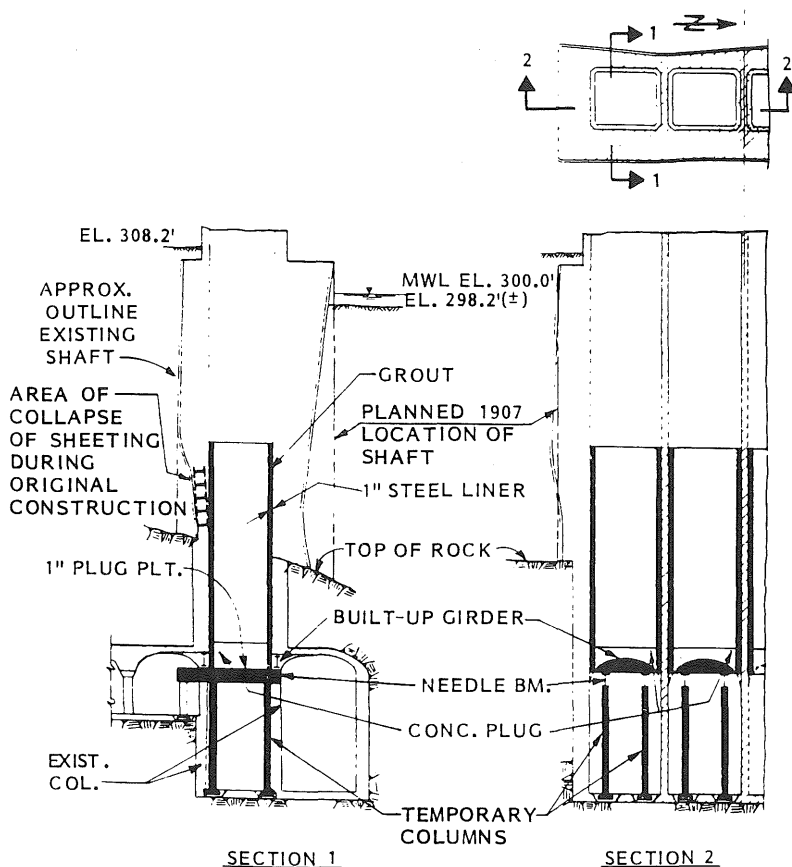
Cross Section Looking West (Preexisting Tunnels and New Construction)
